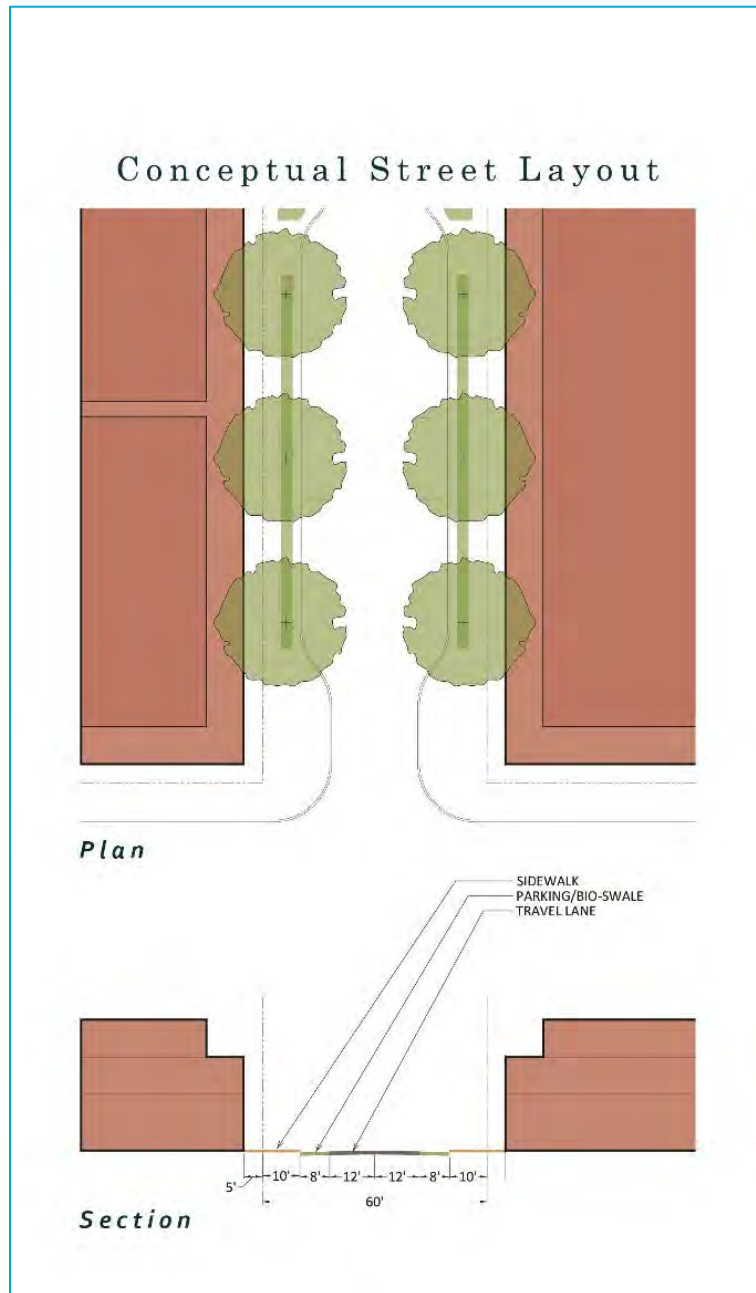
HC Conceptual Site Plan and Cross-Section for Streetscape Program Along Main Street
